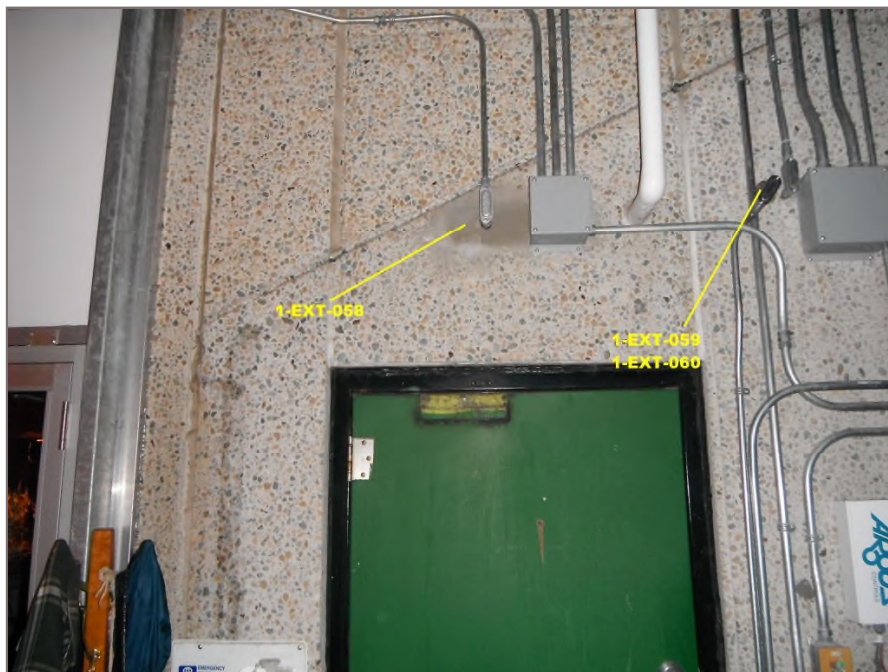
Asbestos-containing light grey caulking applied to the exterior expansion joints of the pre-cast walls. Tetra Tech sample 1-EXT-059.
